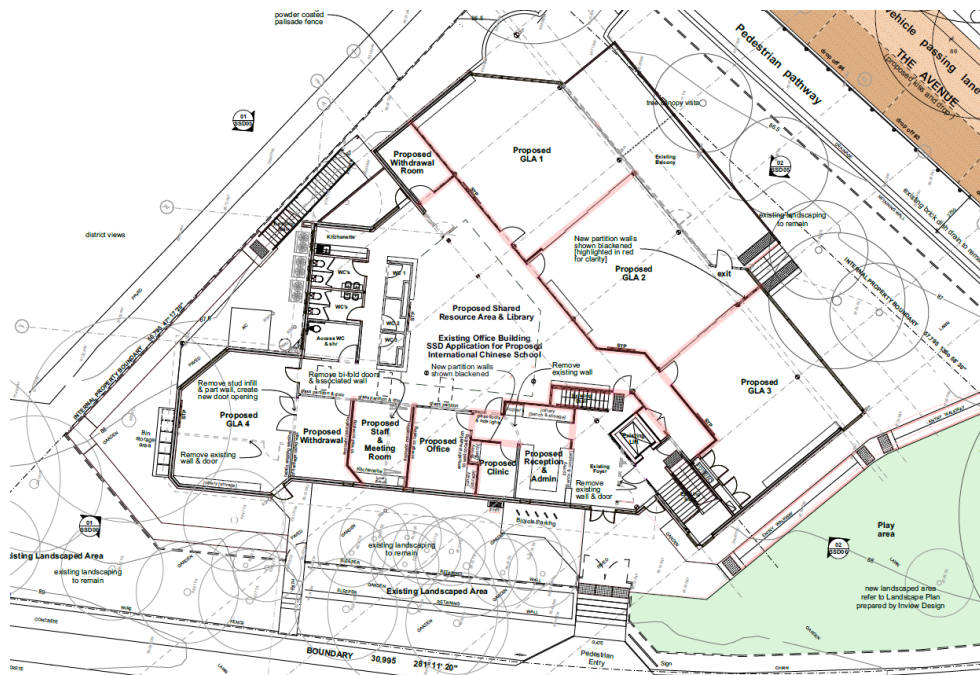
Proposed ground floor plan. (Source: Stanton Dahl Architects)
